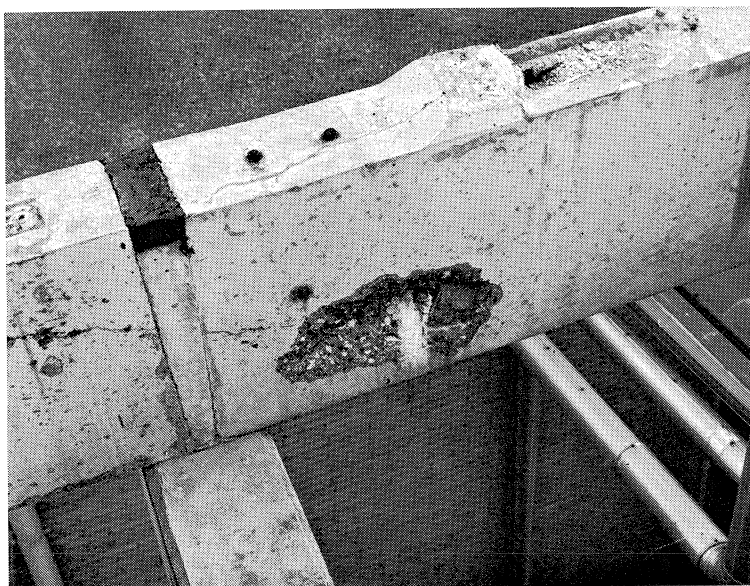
Water collected in the cable duct, with the result that cracking occurred and a piece of concrete spalled off.
